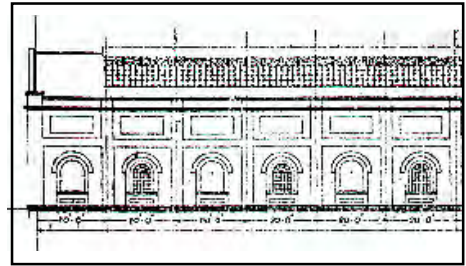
East wall elevation showing the original configuration with alternating blind panels and windows and brick detailing with arched heads to windows, panels over all divided by pilasters. The location of the original rooflights is shown on the roof. Source: SRAO ELW3.
